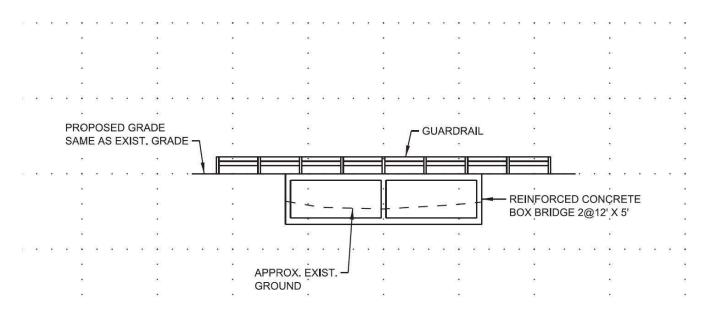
Shows profile of the replacement bridge according to TIR dated 04/12/2018.
